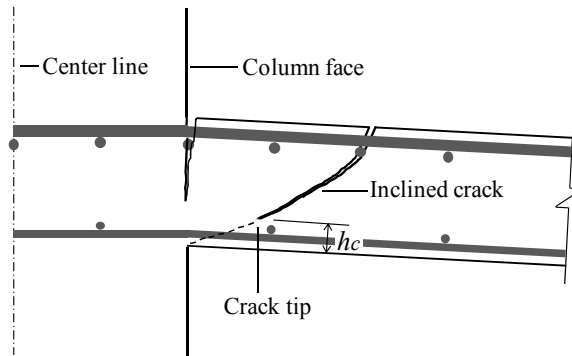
Cracking condition of slab-column connection prior to punching failure
